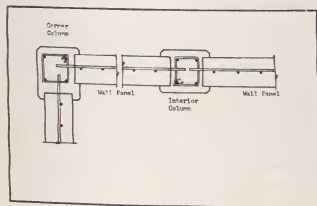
General plan showing how cast-in-place interior and corner column bond the panels into a structural unit.
